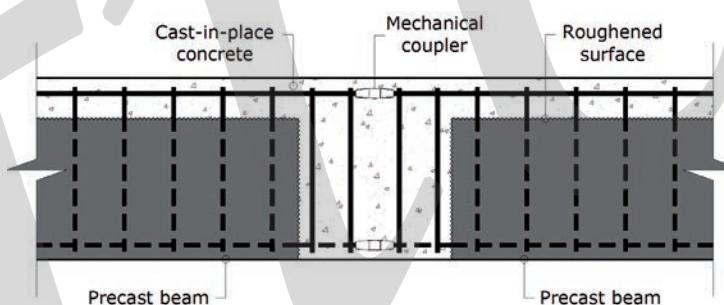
Beam-to-beam connection with mechanical couplers
